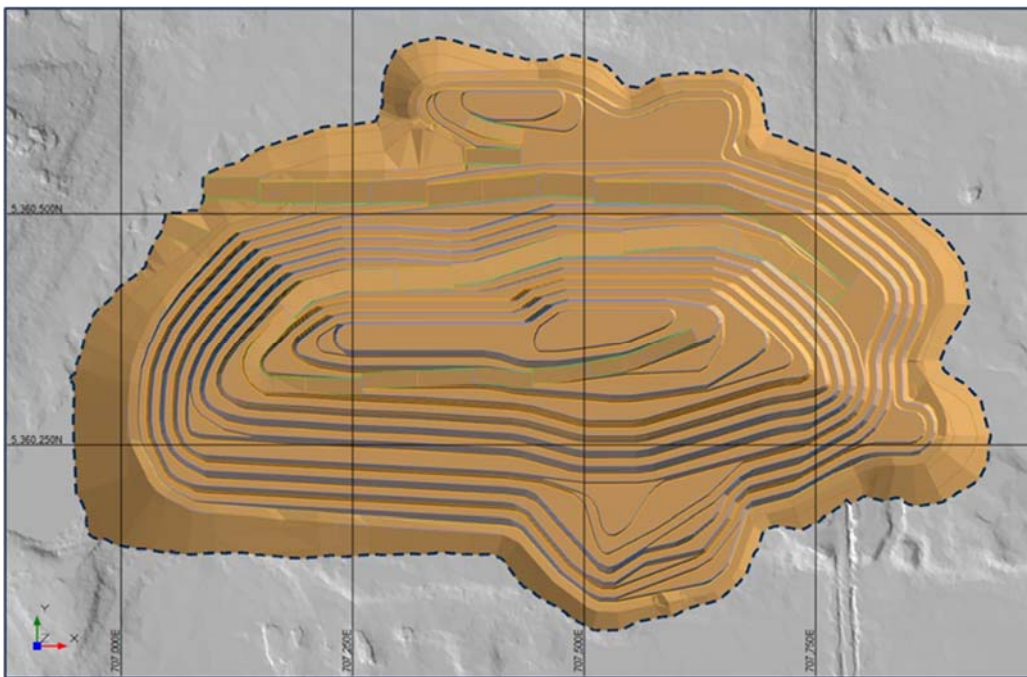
Authier Lithium Ultimate Pit Design Plan View
